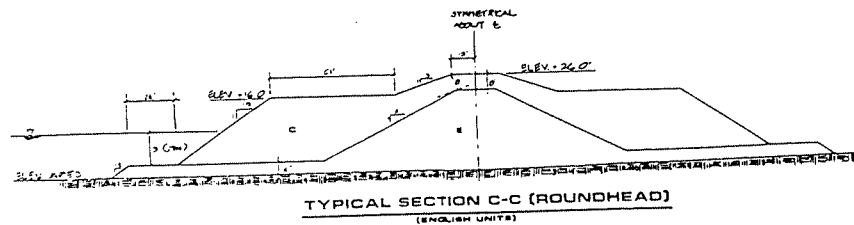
Typical cross-section of berm breakwater roundhead for St George. (Figure from Gilman (1987)). All measures are in feet.
